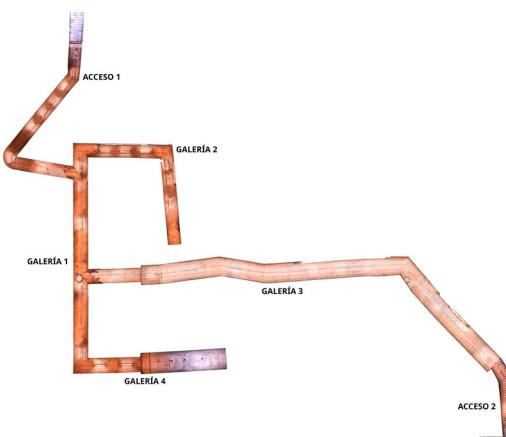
Top view of the 3D model of the shelter at Plaza Tetuán (Author's own)
